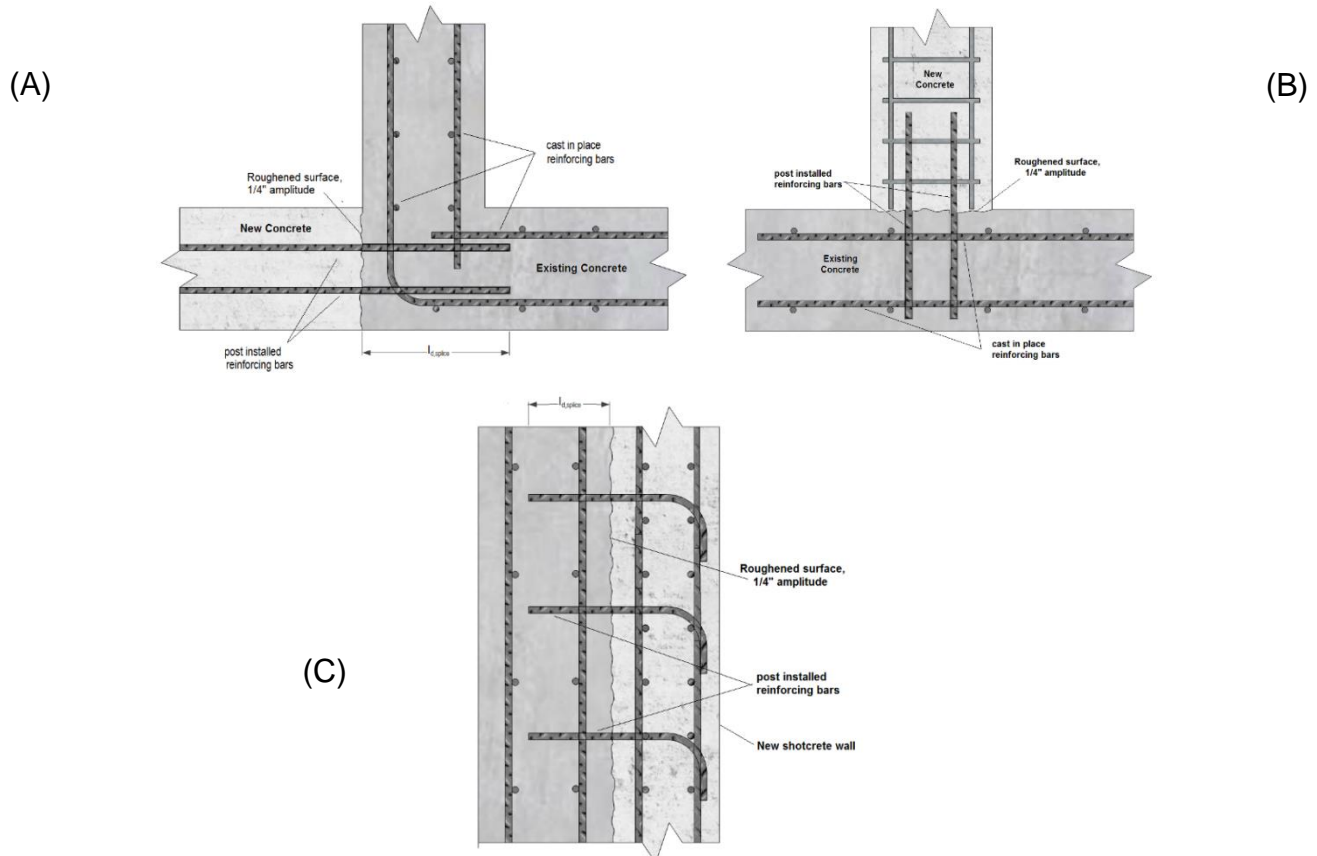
APPLICATION EXAMPLES FOR POST-INSTALLED REINFORCING BARS:
